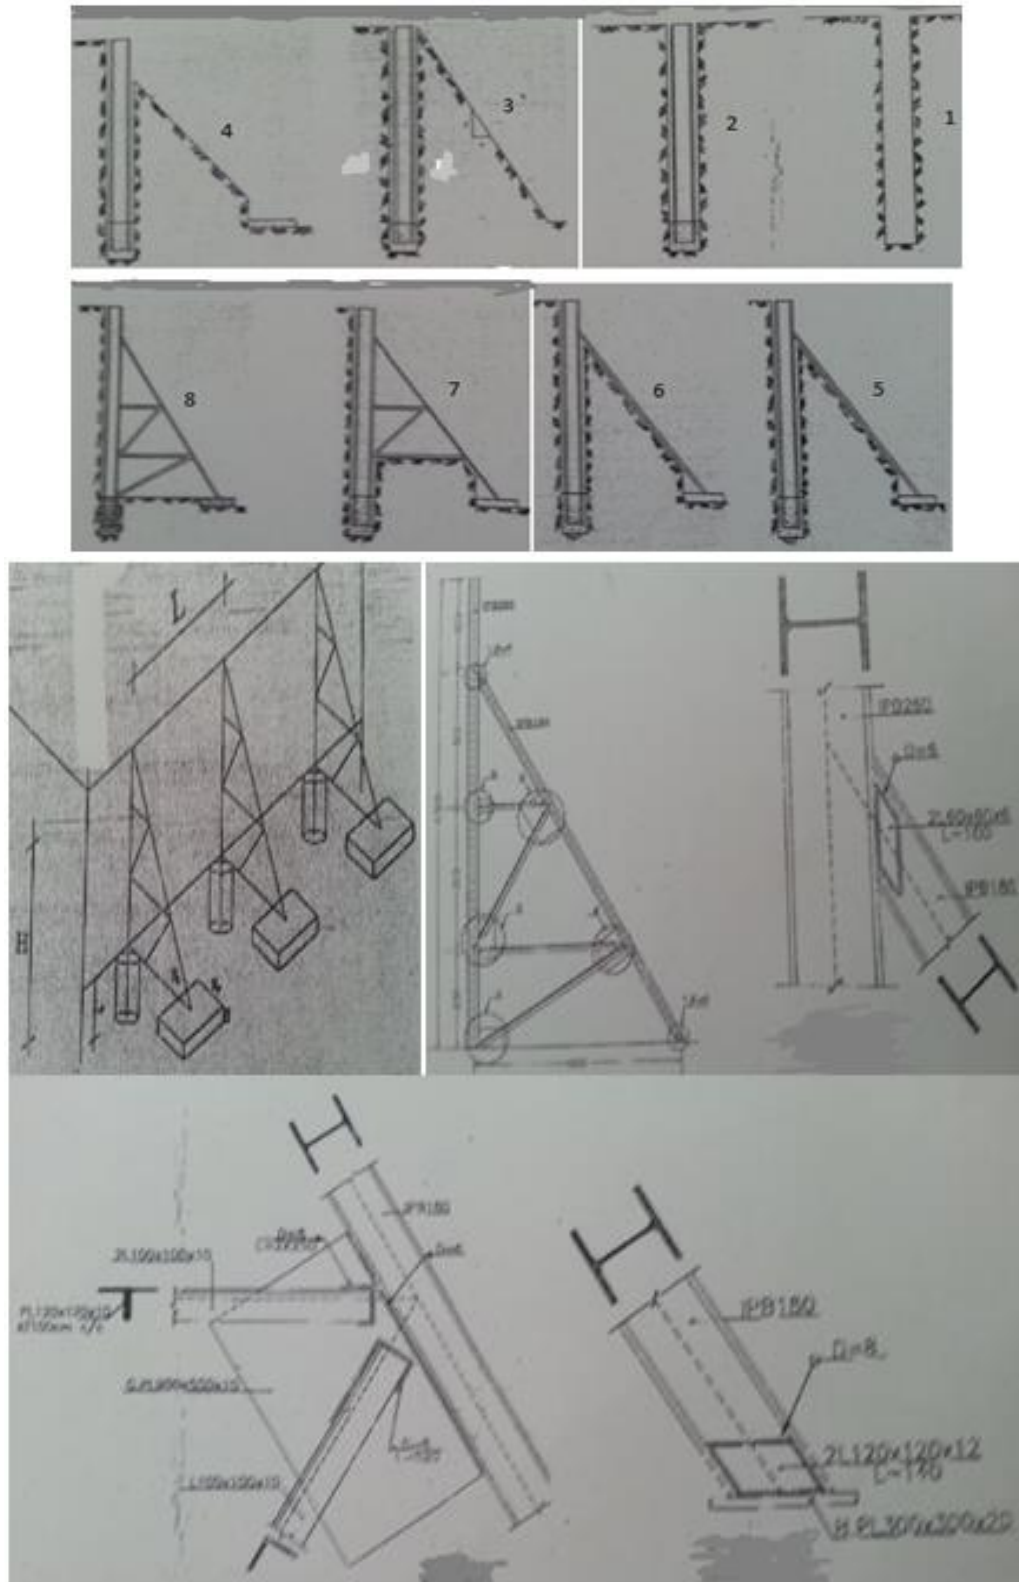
Typical processes and details to use soldier beam as a truss with lagging
